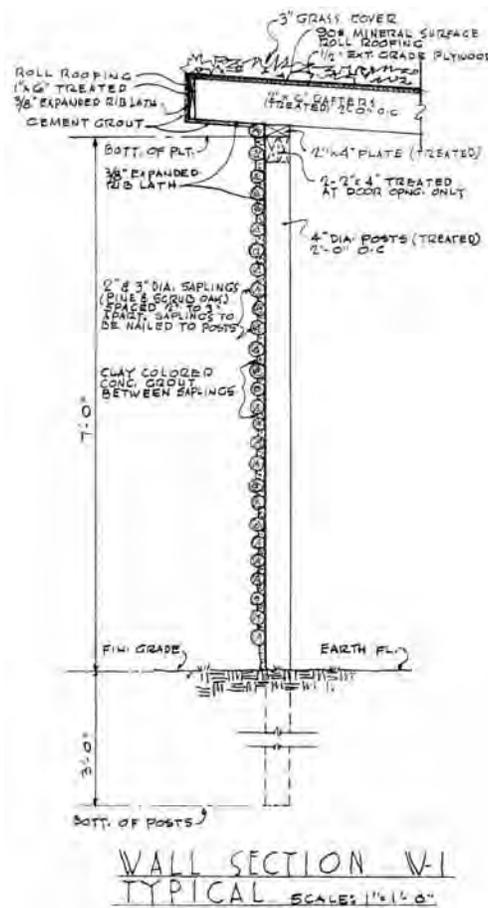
Vietnamese house typical wall section, Camp Gordon, 1966 (standard drawing GOR 28-13-09 sheet 16, Vietnamese and Montagnard houses plans, elevations, and sections, 1 April 1966).
